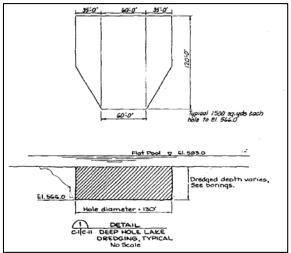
Channel Design for Deep Holes (Sheet C-11 O&M Manual)
